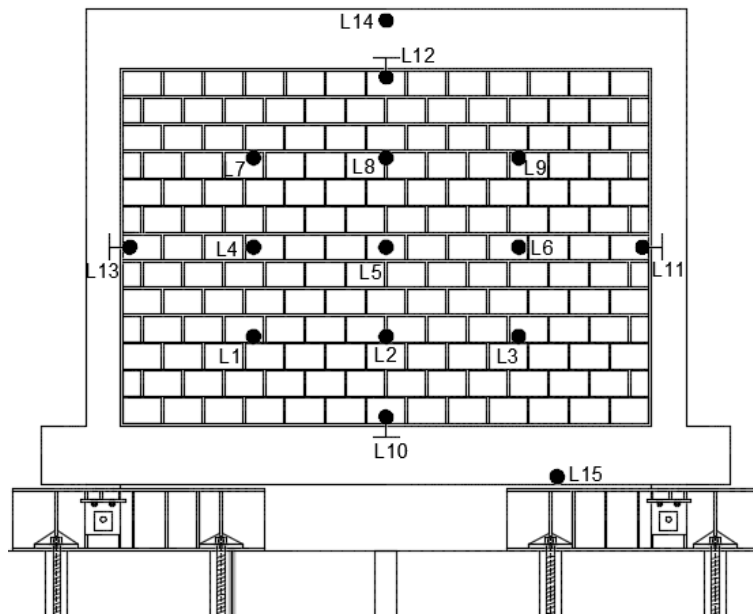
Instrumentation plan adopted for the out-of-plane testing
